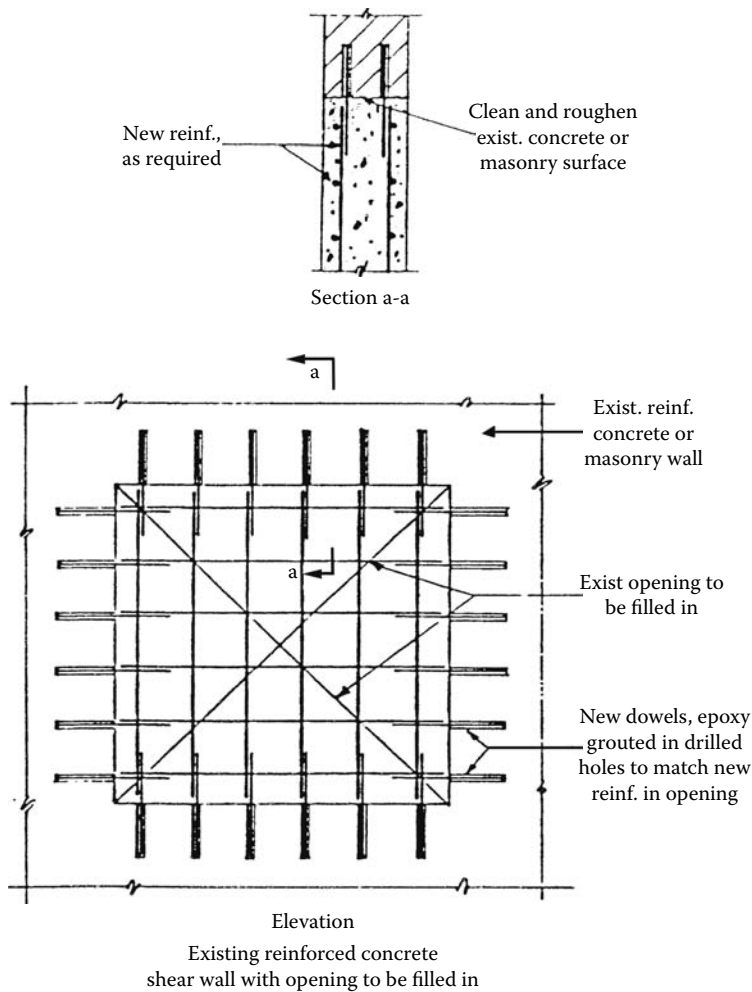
Strengthening of existing reinforced concrete walls by filling in openings.
